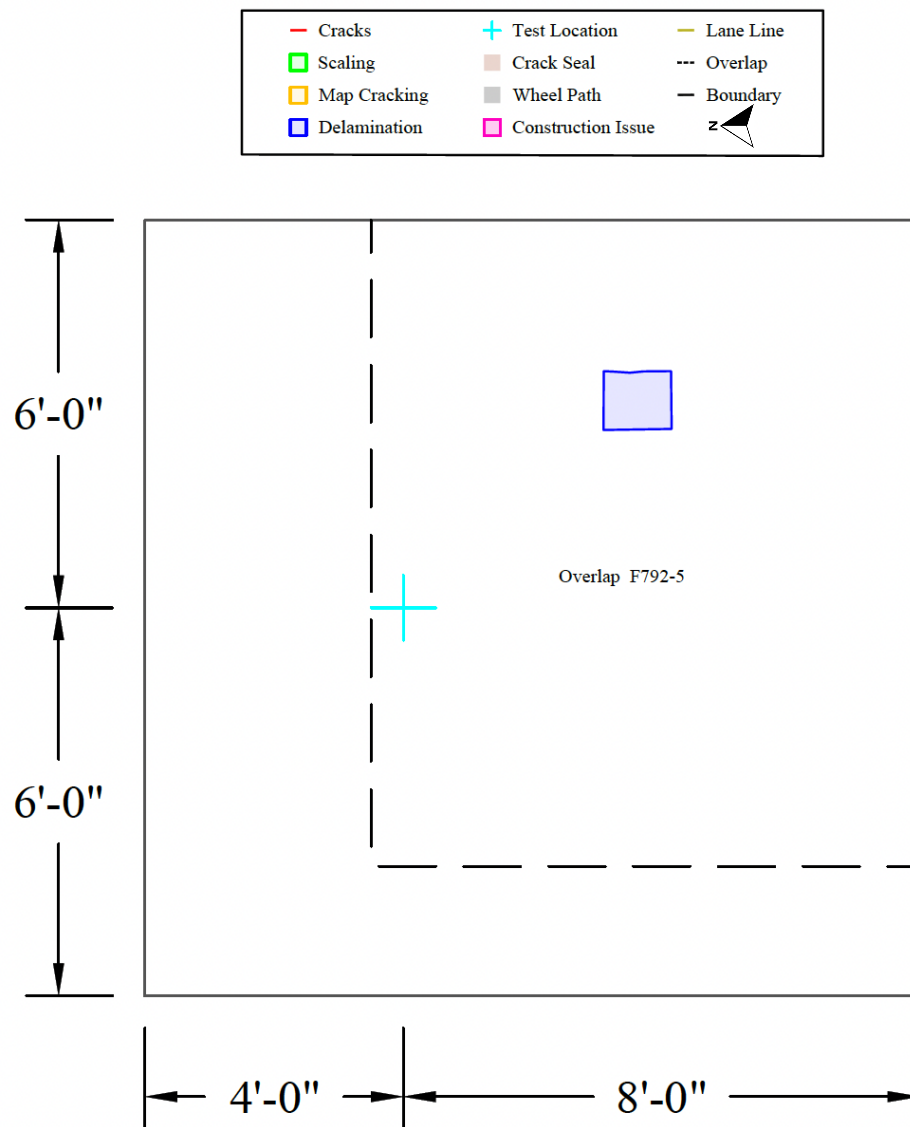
Test location 4 of lightweight concrete deck at bridge F-792.
